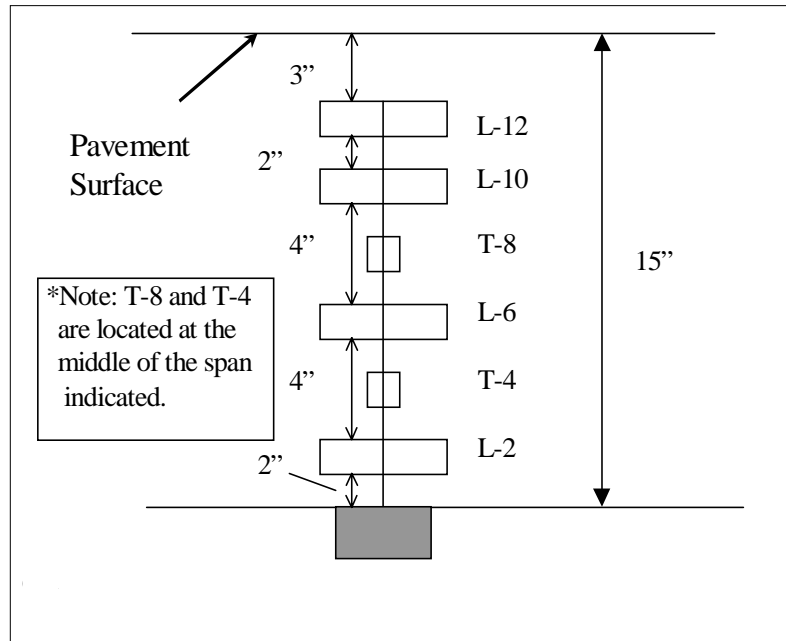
Layout of Concrete Strain Gages in Tower Configuration.
